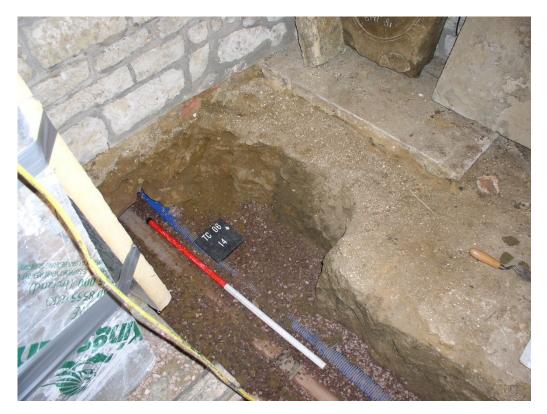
Service trench, north aisle - foundation 14 (north arcade wall) from north-east
